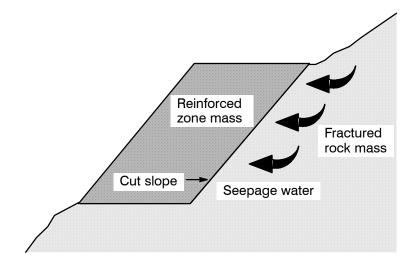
Water infiltration in a reinforced slope for road widening projects.
